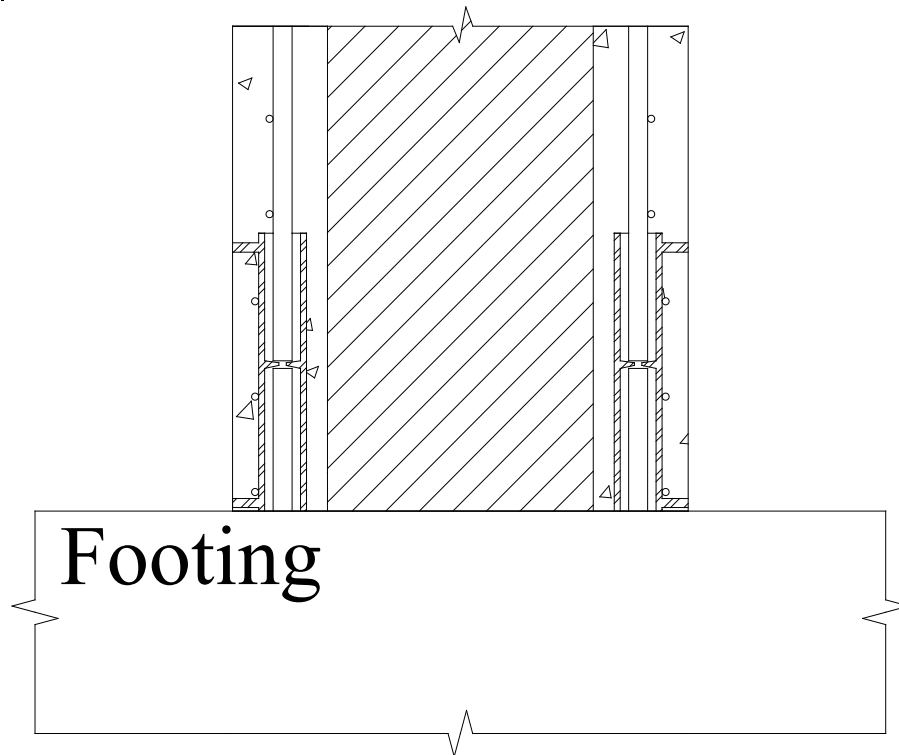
Precast column-footing connection model with grouted couplers tested at UNR
